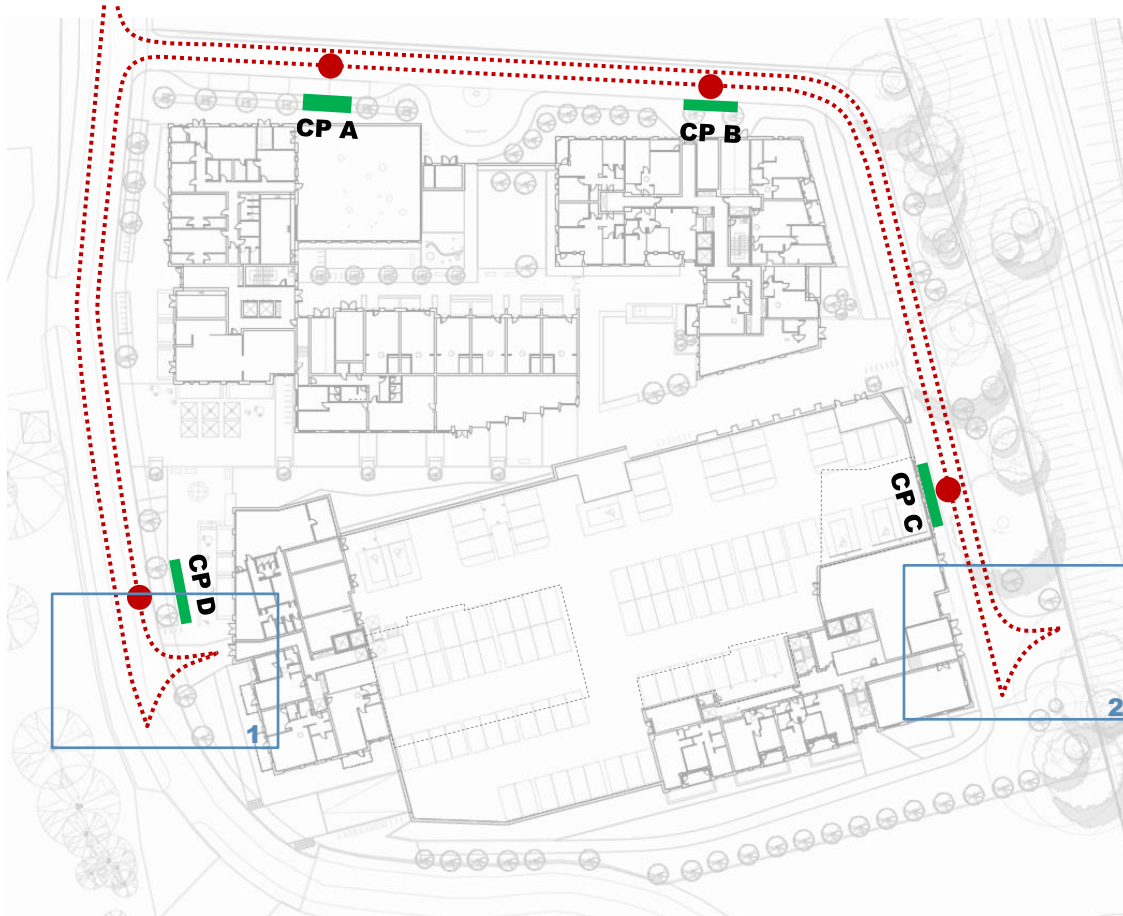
Ground Floor Plan highlighting Collection Points + Refuse Pick-up Locations | NTS
